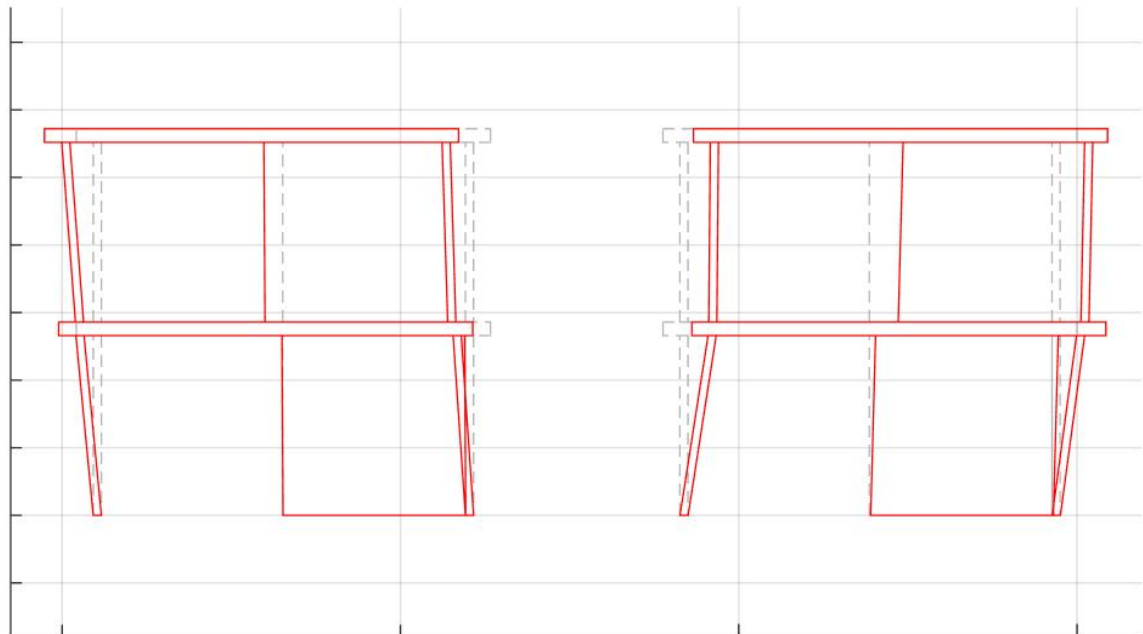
Deformed shape of EUC-BUILD4 retrofitted specimen (max and min) – Test run #7R.
